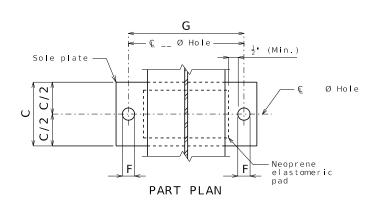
/4"Ø THRU 2 1/2"Ø ANCHOR BOLTS
